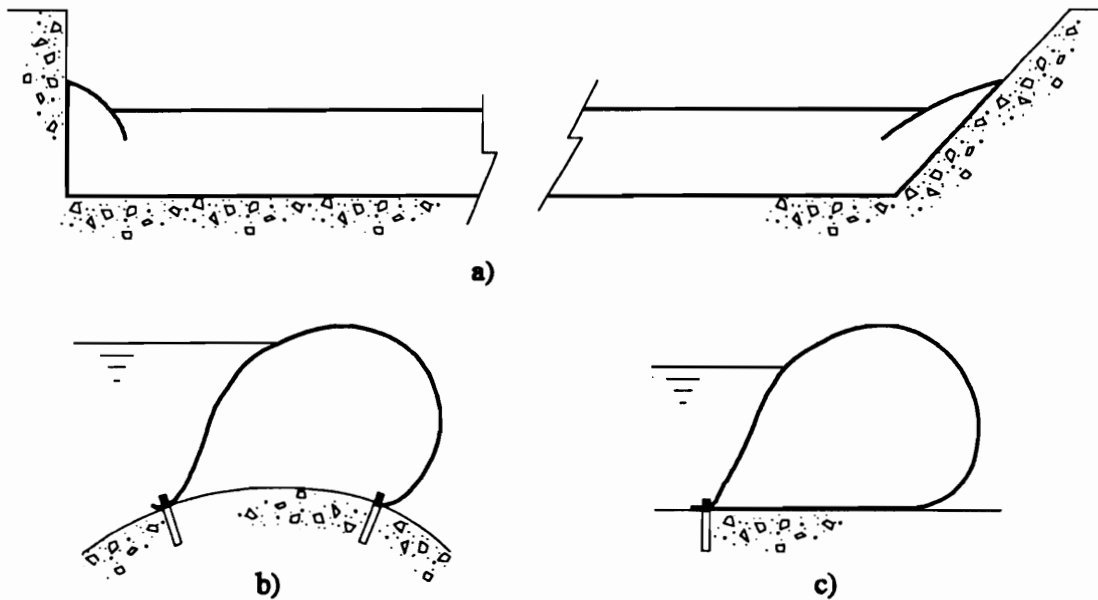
Typical inflatable dam: a) Longitudinal section with vertical (left) and inclined abutment (right); b) Cross section on a curved base (weir's crest) with double anchorage method; c) Single anchorage method.
